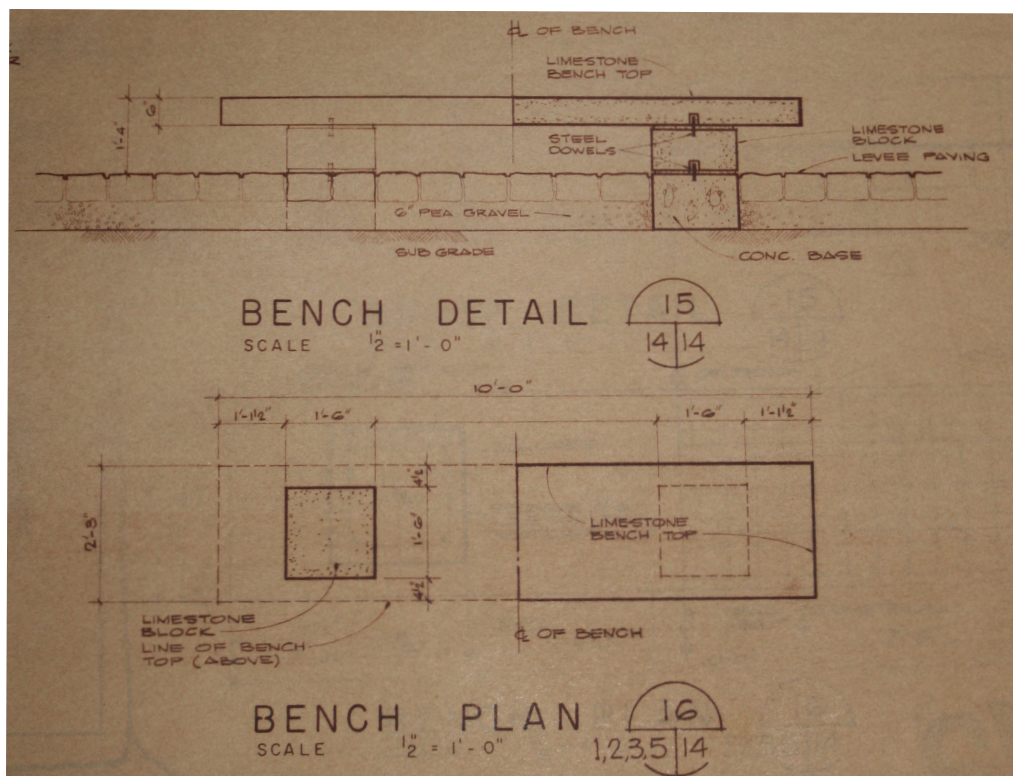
Eero Saarinen & Associates, Drawing SD-13, Bench Detail, 1960. (JNEM Archives, D-120-906)
